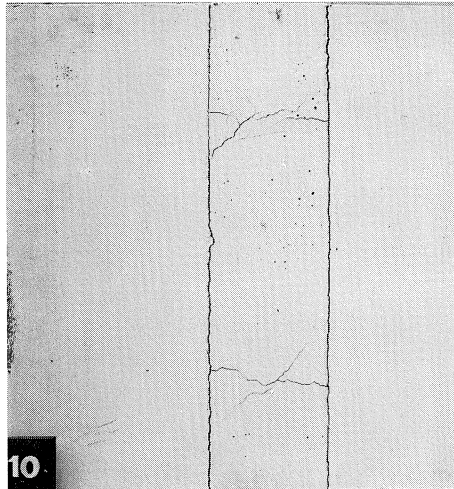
Failure pattern of a loop connection without transverse reinforcement (No. 133 in Appendix 2).
